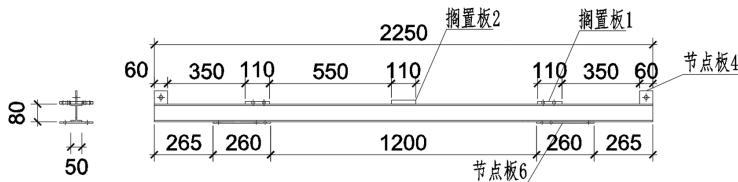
Long transom in elevation drawing (unit: mm)
